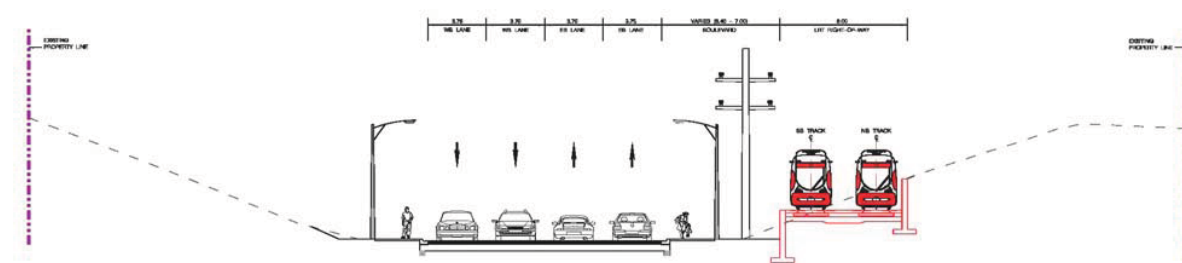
Typical Cross Section: Morningside Avenue Over Highland Creek
